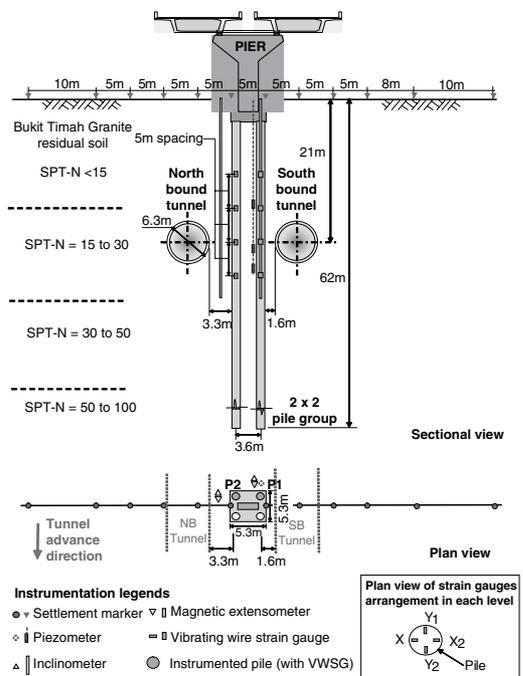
Typical section and instrumentation layout for pile-tunnel interaction study reported by Pang *et al.
